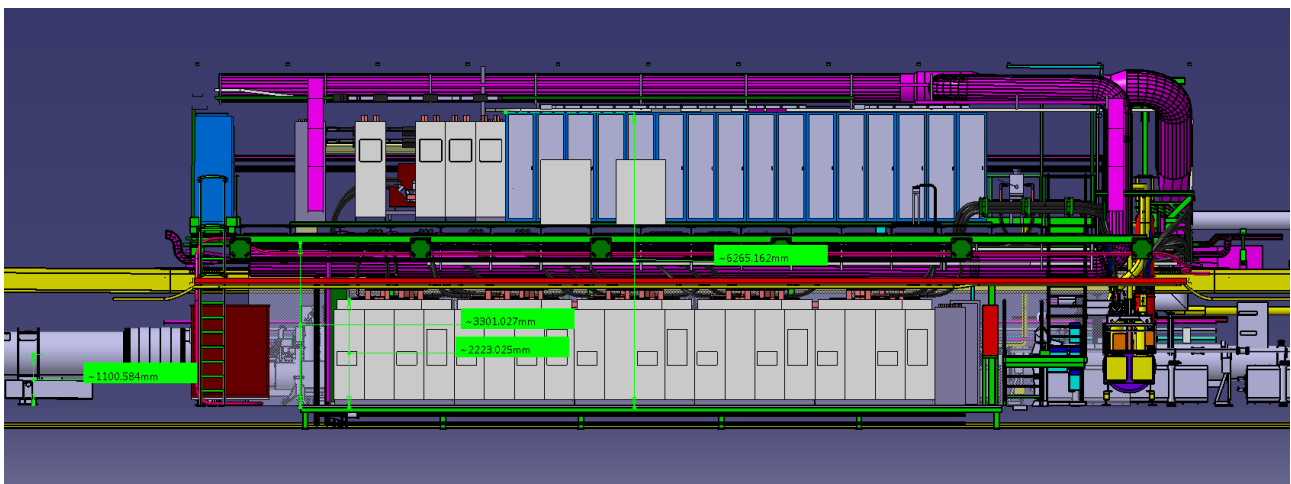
Present CAD drawing layout of the installed equipment in RR13 with equipment heights, ST number ST0509462
